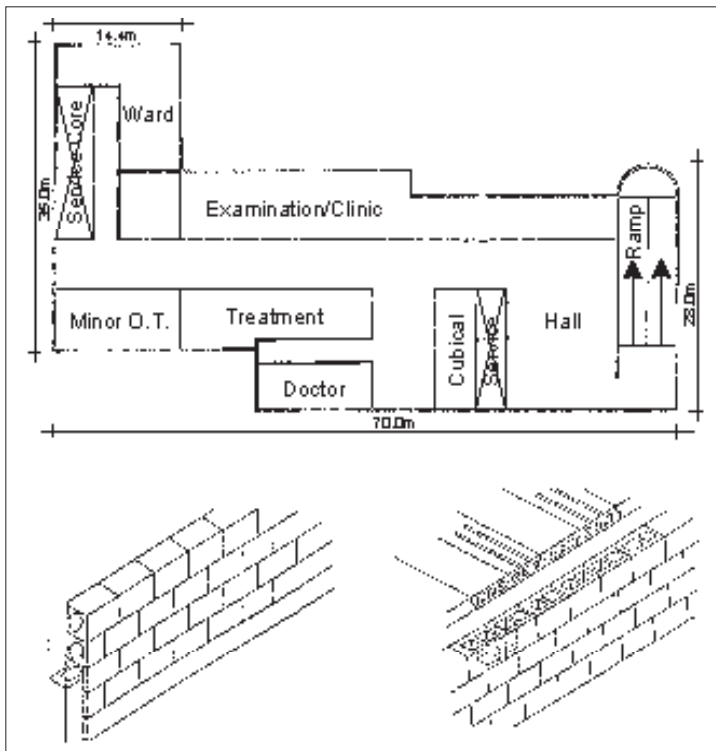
Schematic Floor Plan of Indira Gandhi Hospital, Shimla, and Sections Showing Cavity Walls and Roof Bricks
